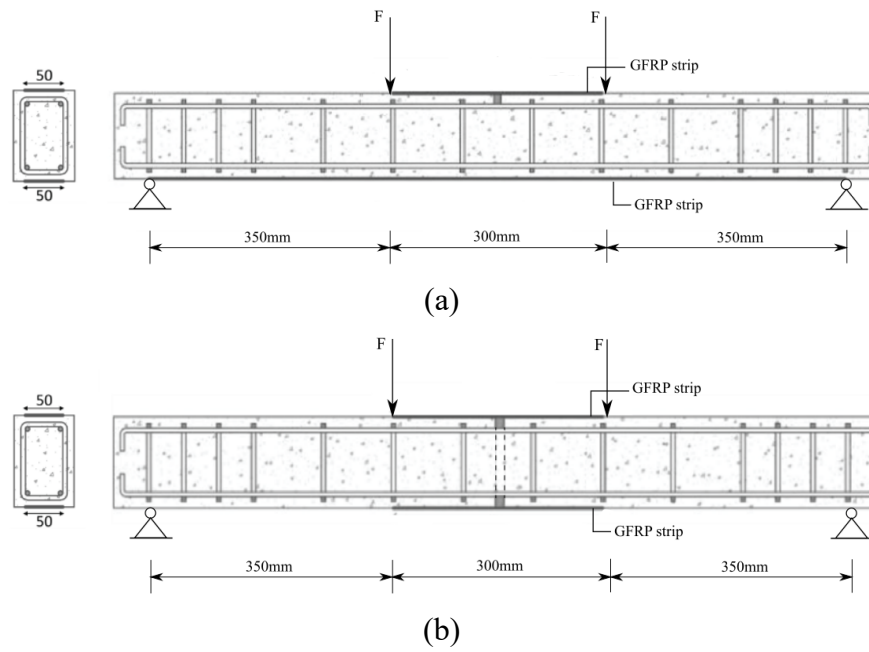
RC beam strengthened with GFRP: (a) beam type A and (b) beam type B.
